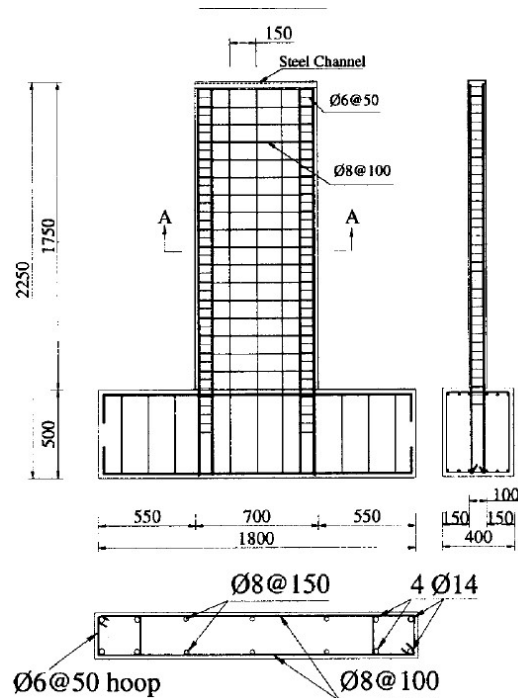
Typical details of walls tested by Zhang & Wang (2000)
